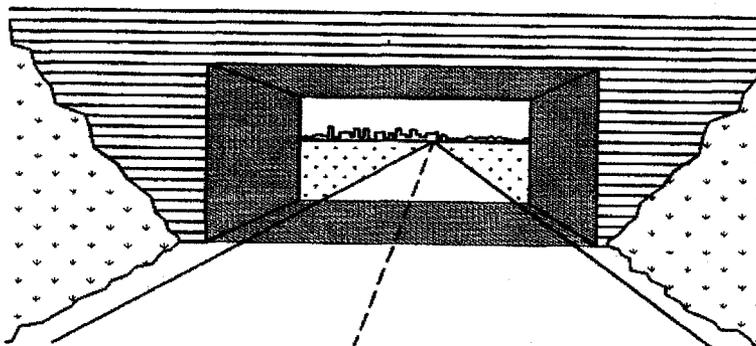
Short Tunnel appears as a Dark Frame (Schreuder, '64)
